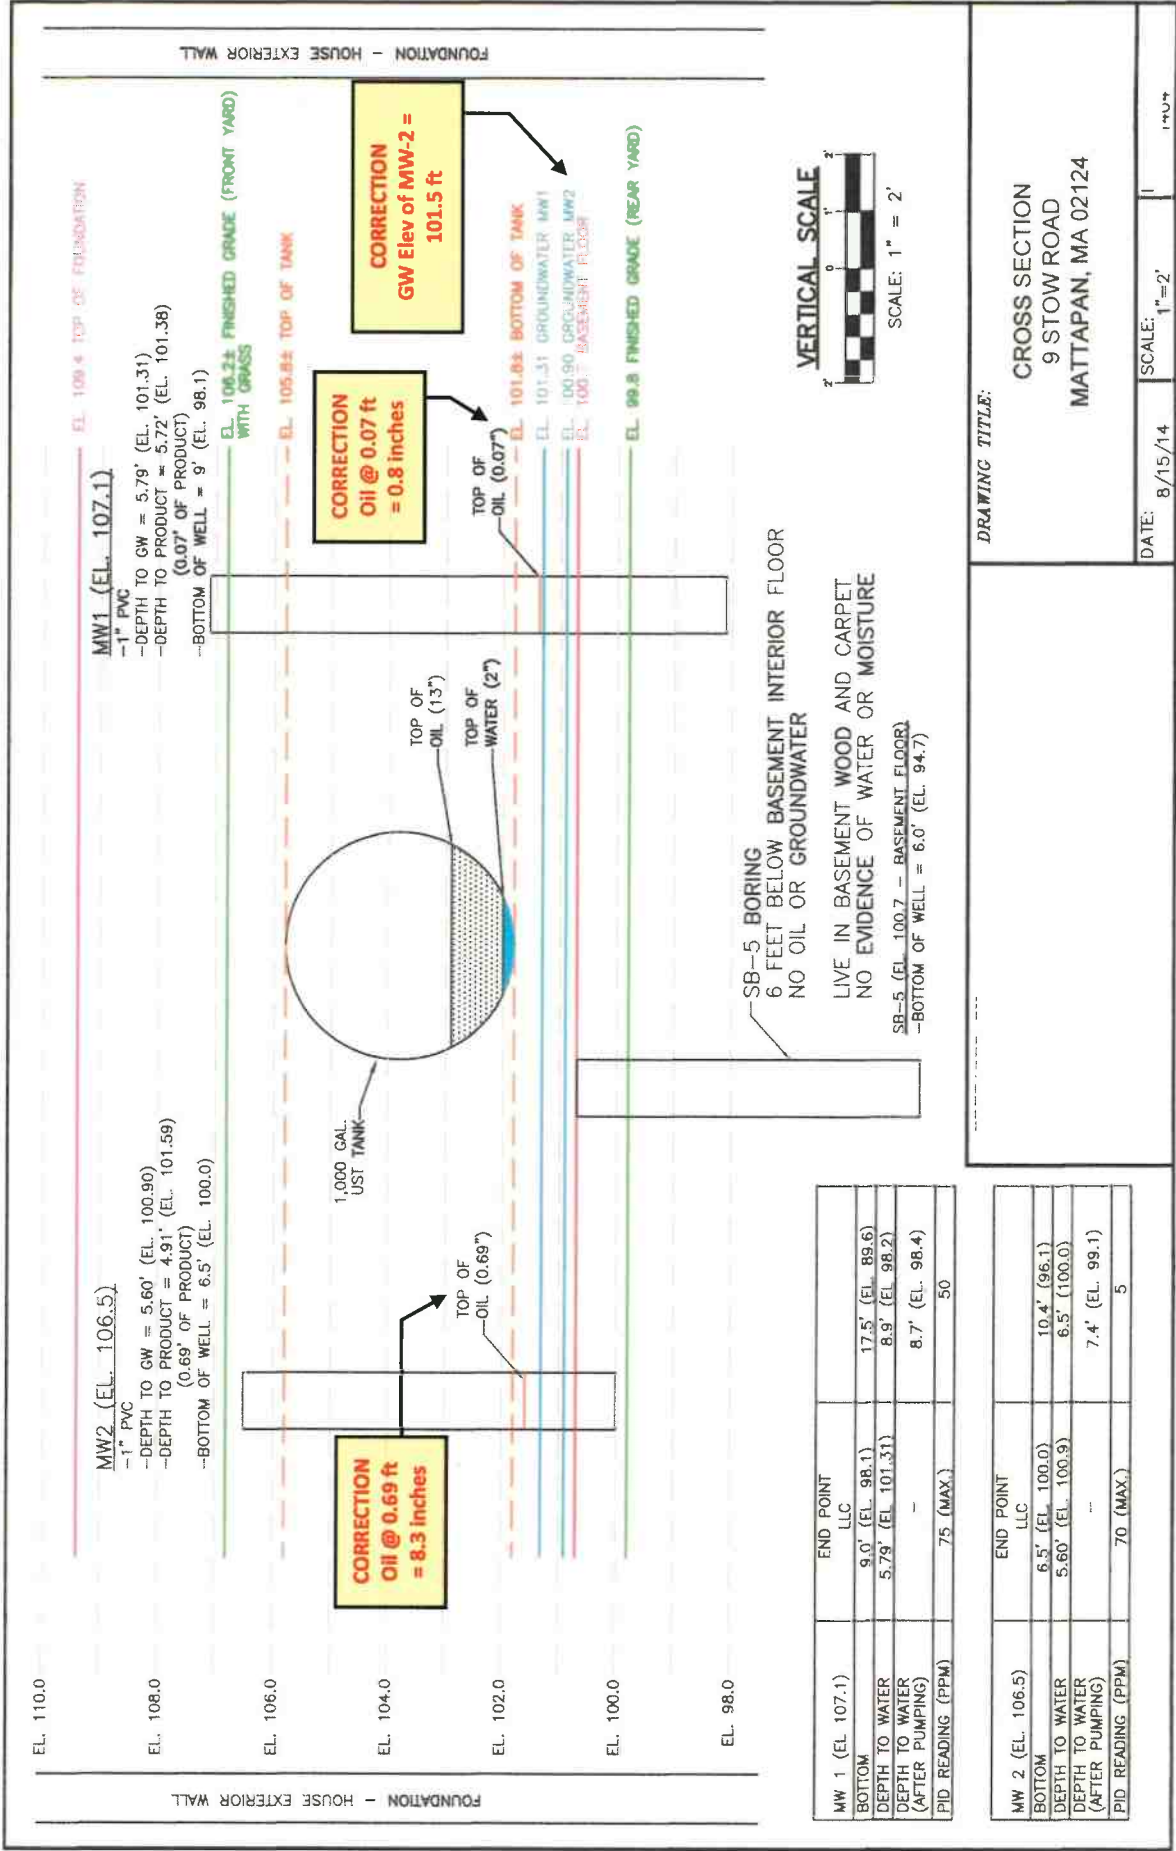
Cross section plan provided to MassDEP (with corrections noted)
